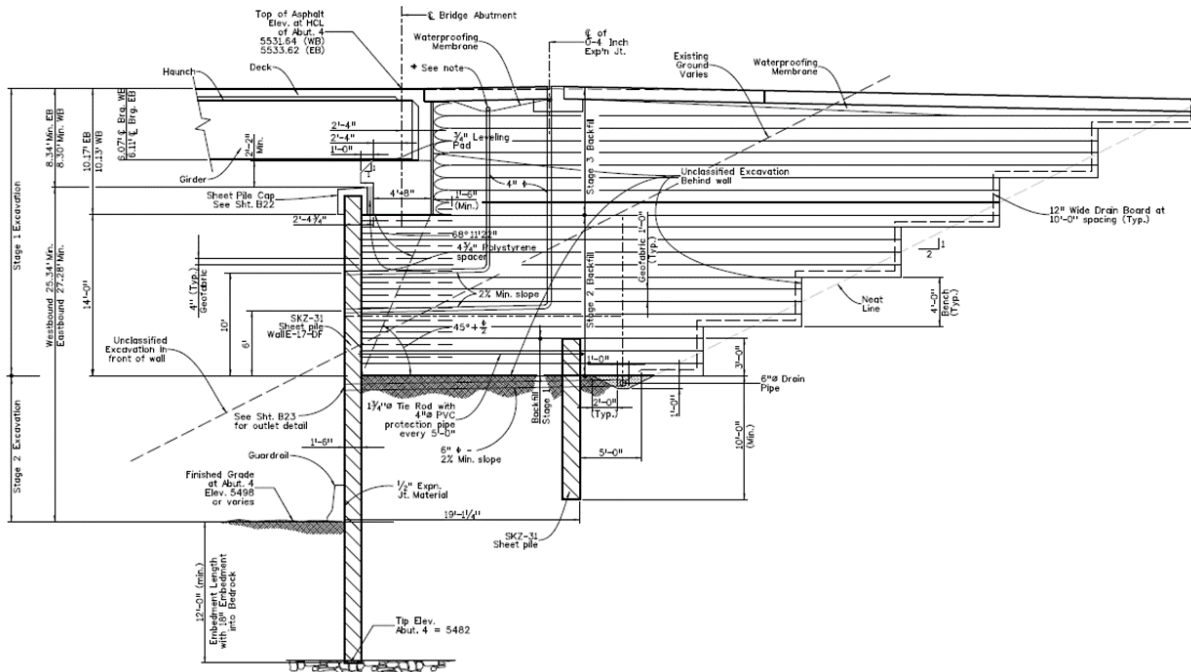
Diagram. GRS abutment section view of abutment 4, E-17-AEK.
